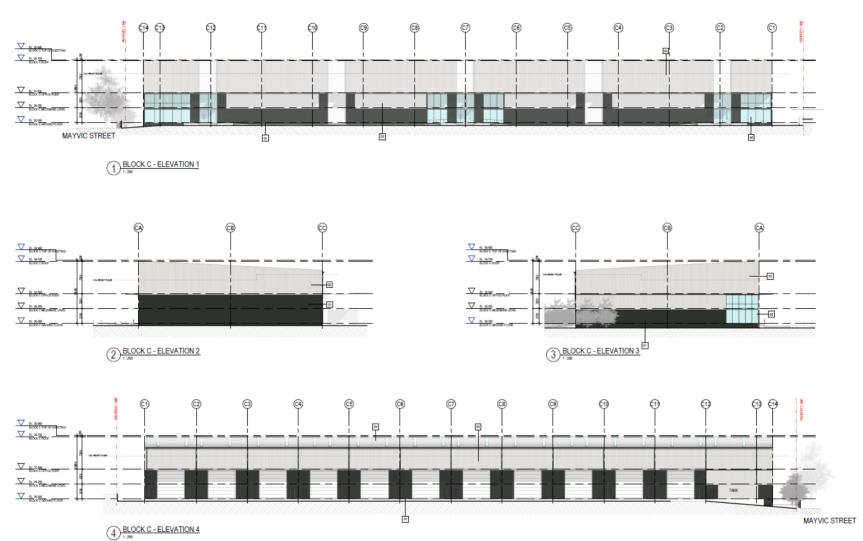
Warehouse C elevation showing proposed building height compared with existing 12m height control (Source: Group GSA)
